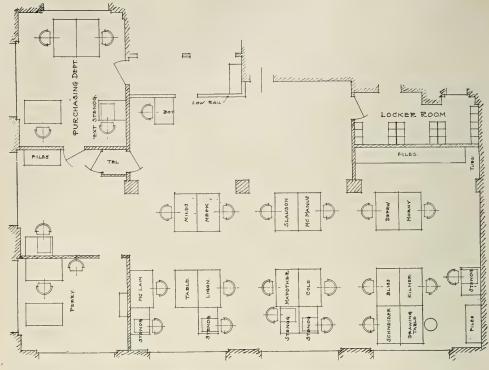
TYPICAL FLOOR PLAN (SEVENTH FLOOR).
